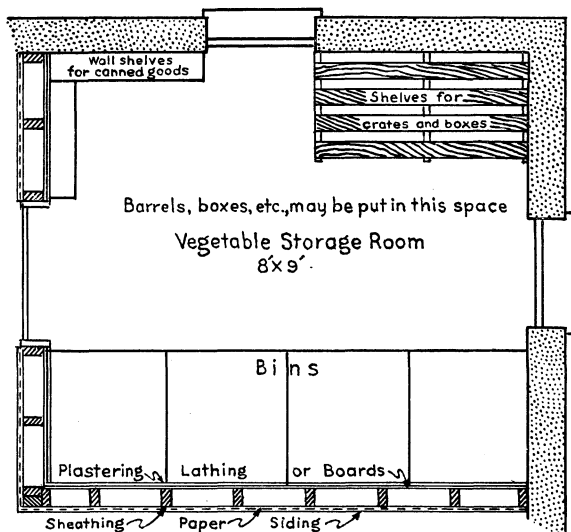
Floor plan of a storage room in a corner of a basement. The arrangement of the shelving and bins may be changed to suit conditions. While the construction of the wall may be varied, it must be tight.
